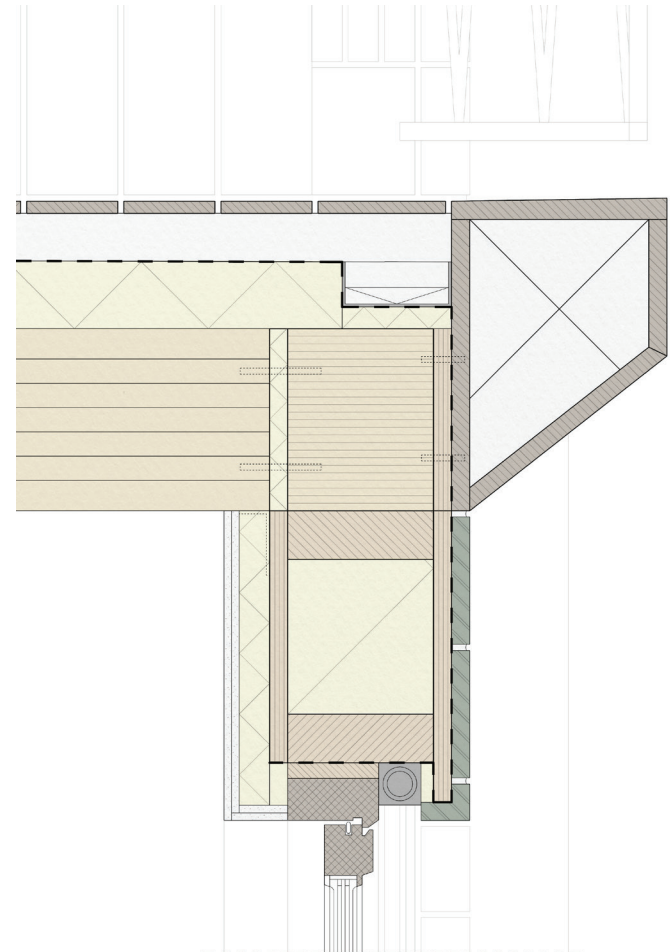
Detail of the connection between the new facade and the CLT main structure. Drawing by author.
